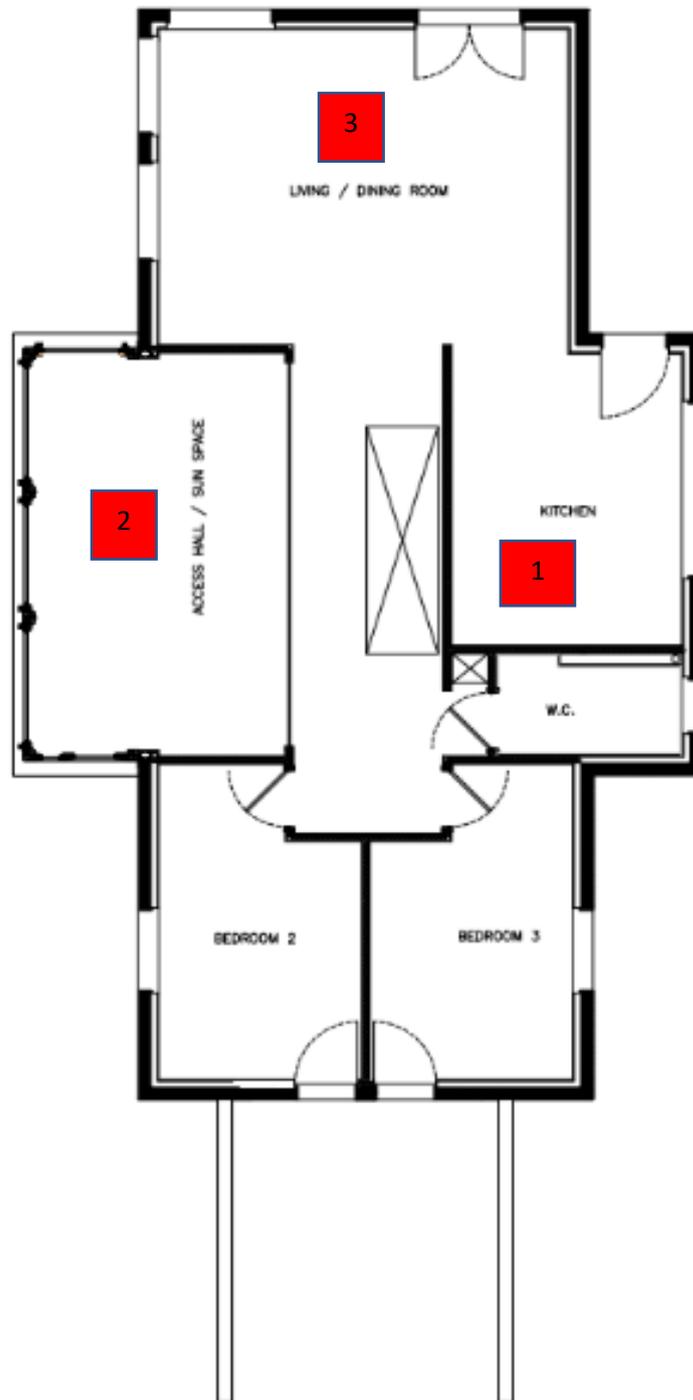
A floor plan for the Eco-house showing the location of the sensors: 1) the PM an VOC sensor; 2) the CO2 sensor
